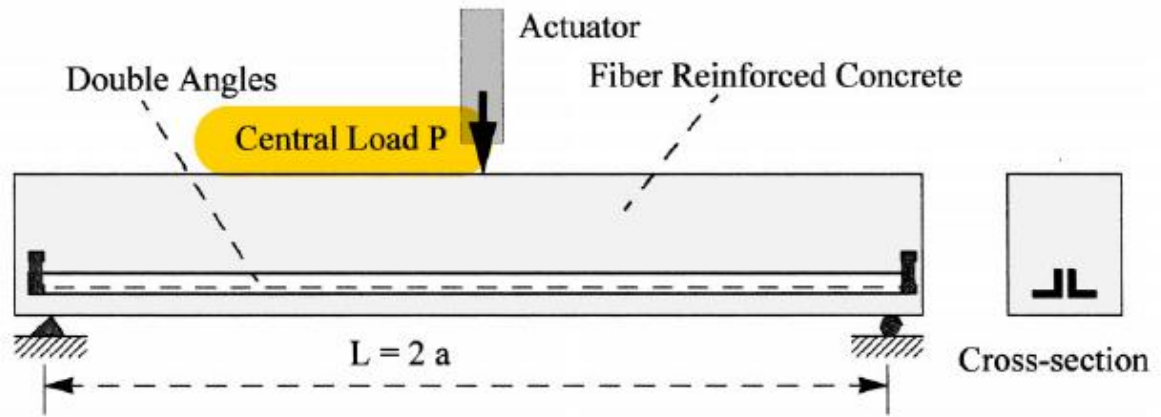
Design of SFRC Encased Steel Joist Composite Beam [11]
